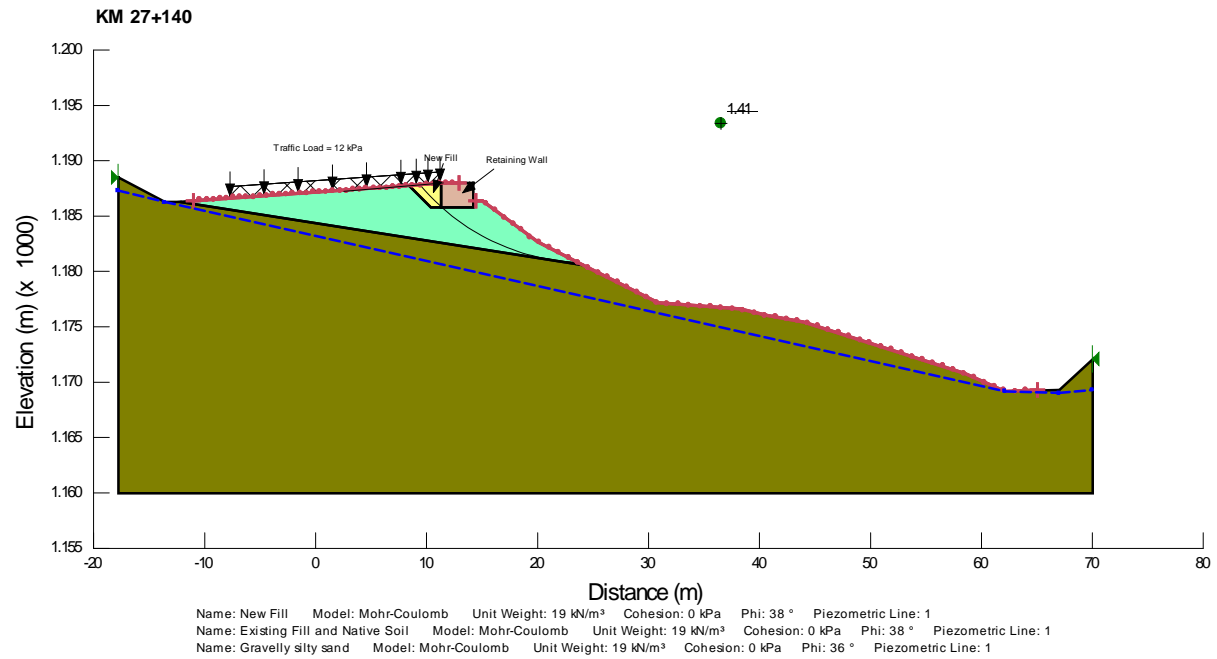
Station 27+140 – Global Stability of the Slope after Construction of the Retaining Wall
